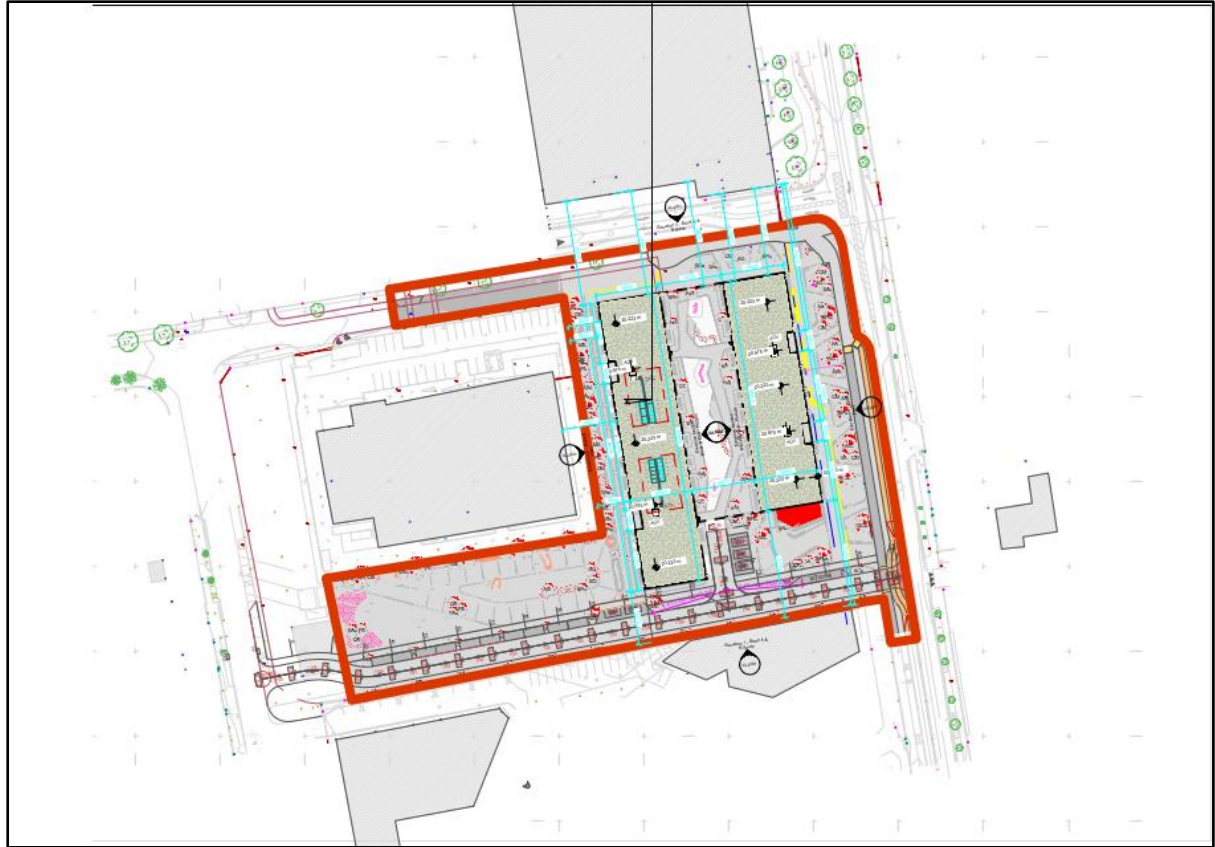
Site Plan for proposed Whitestown Way, Tallaght, Dublin 24 (Not to Scale)
